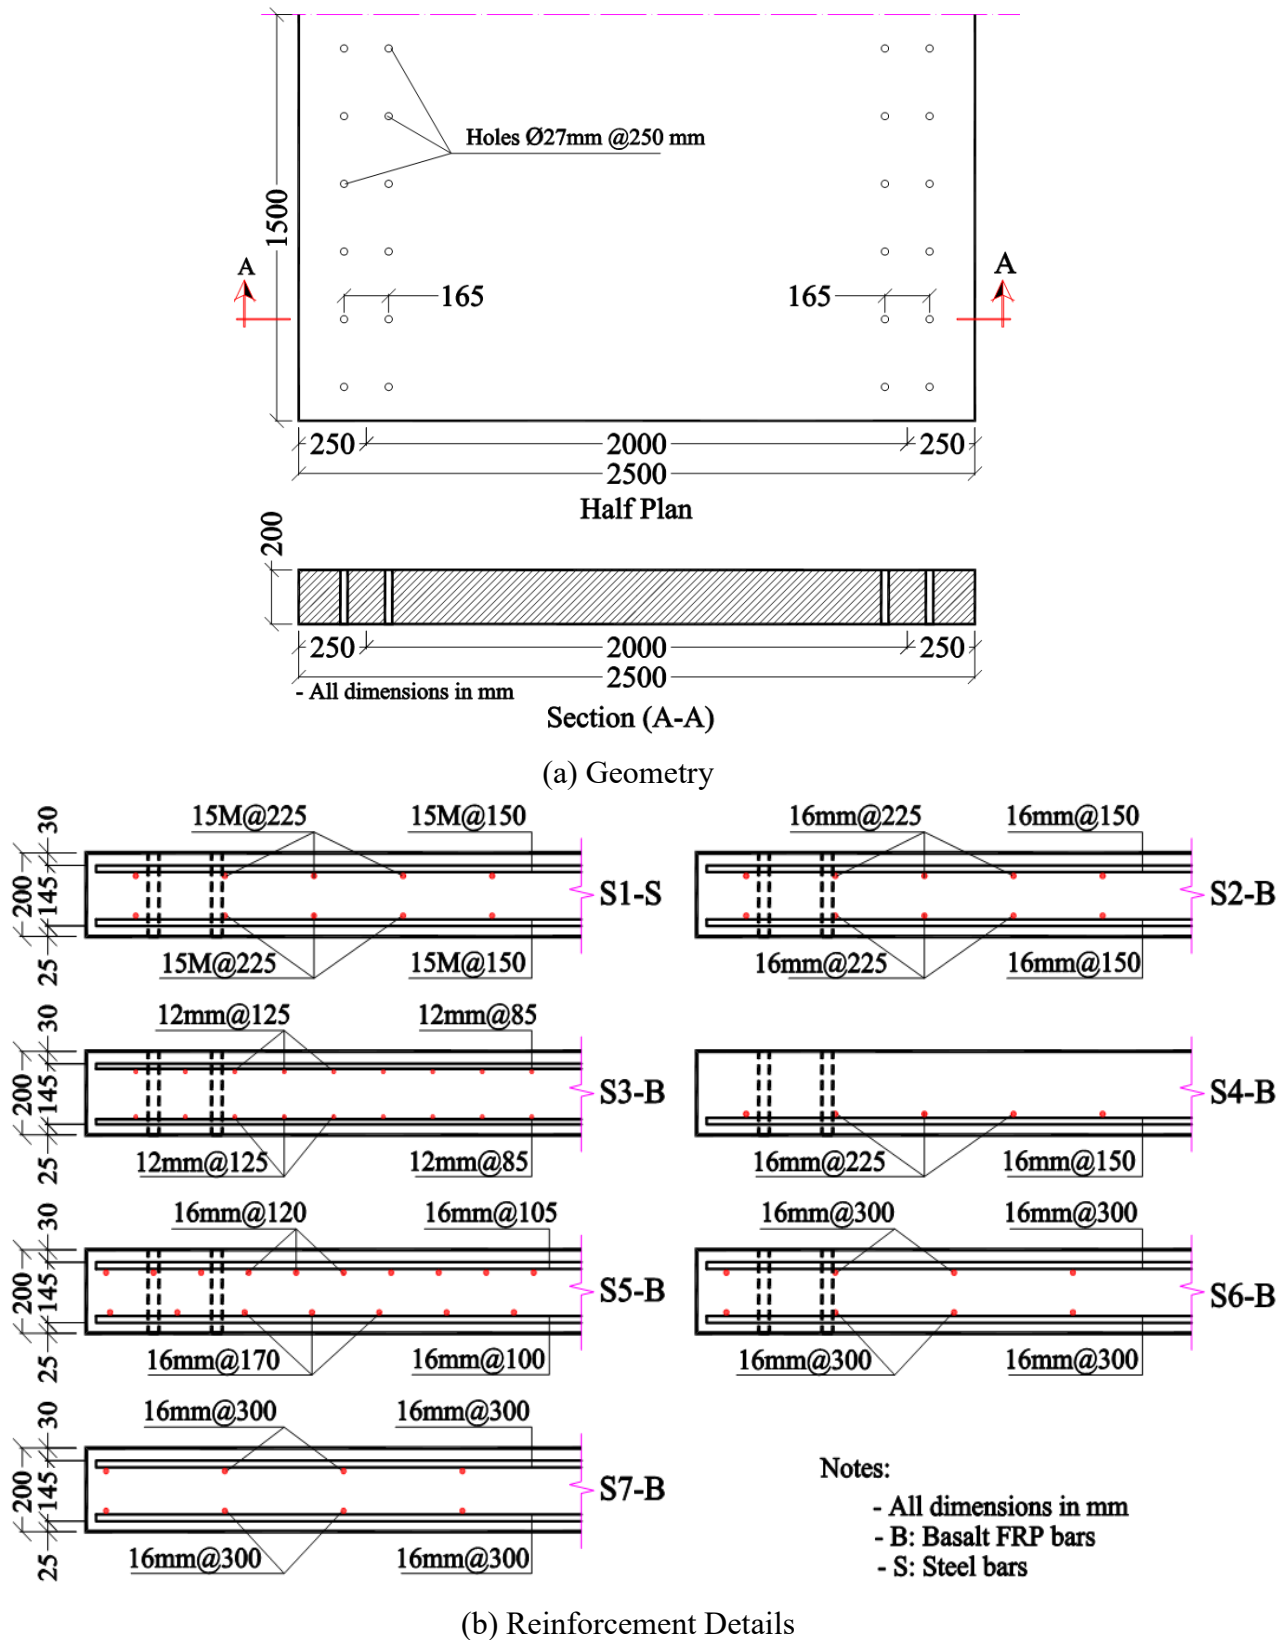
Geometry and reinforcement details of the tested concrete deck slabs
